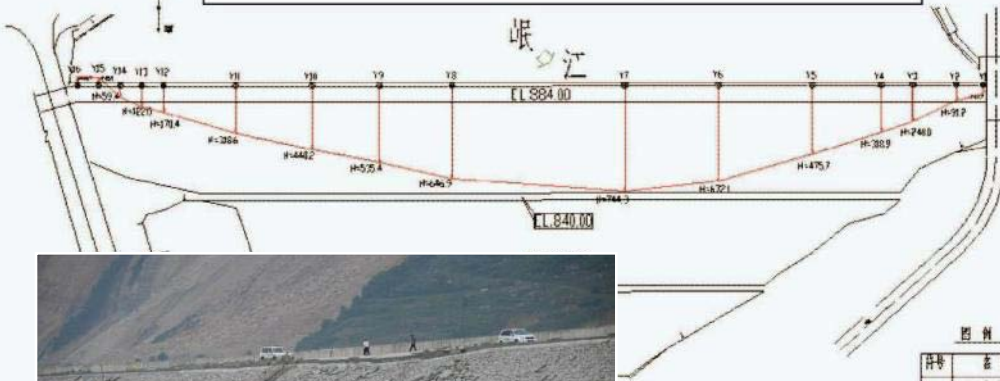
Failure in terms of longitudinal cracks in an earth dams
